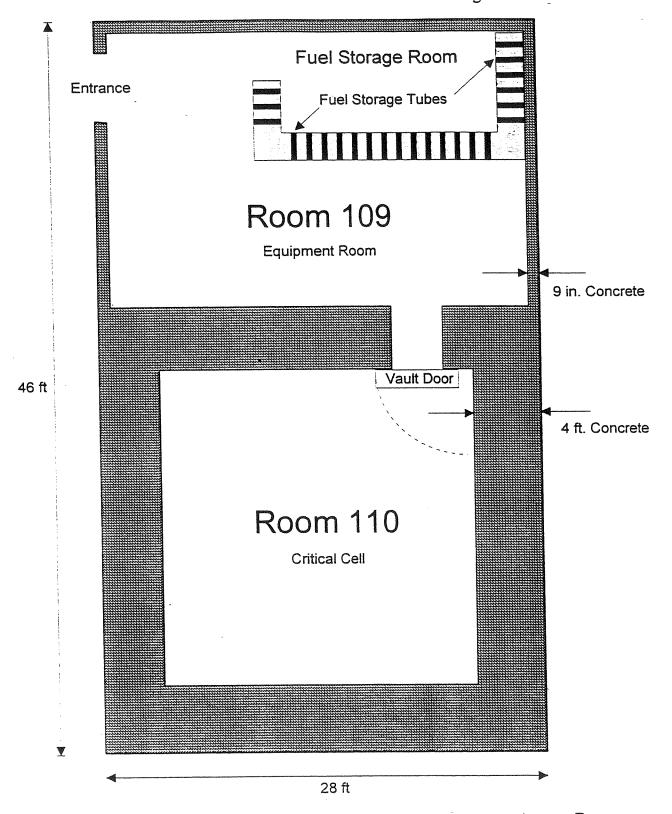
Existing Layout of Building T012 Critical Cell and Equipment Room
